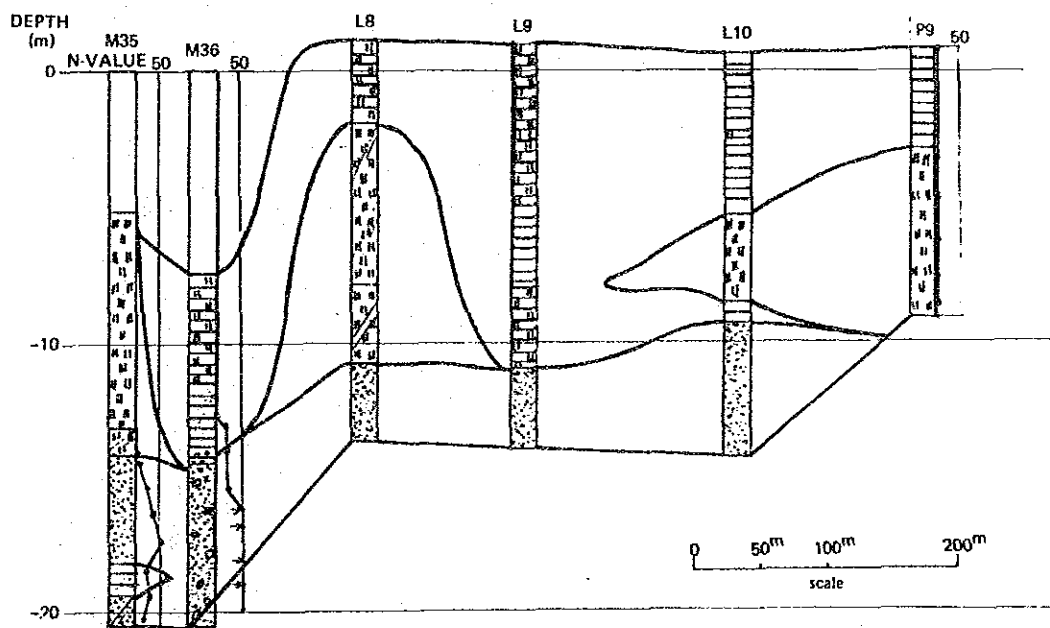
Soil Profile, Section ⑧ - ⑧
